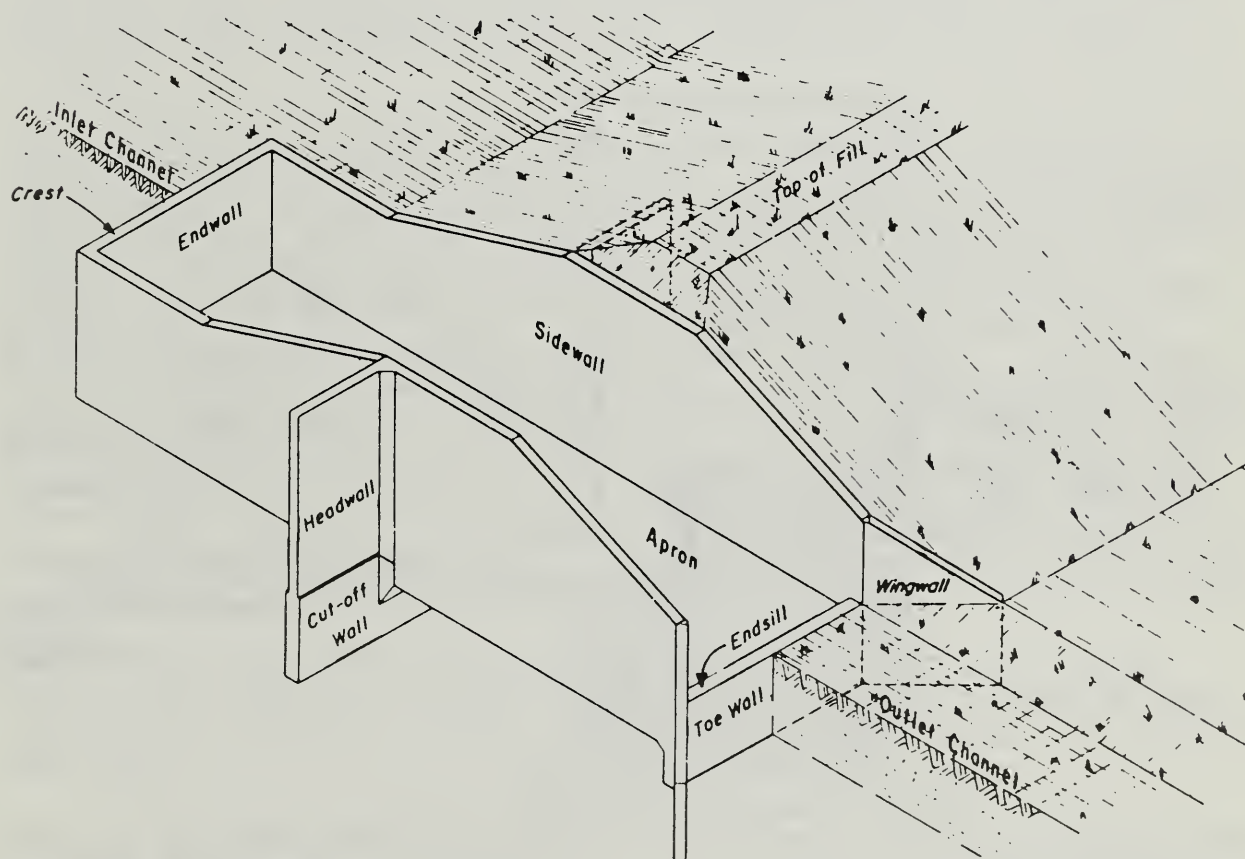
GRADE STABILIZATION STRUCTURE
